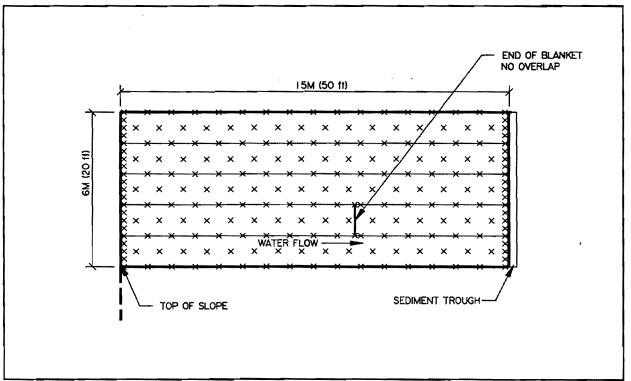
American Excelsior Curlex® 1:2 Installation Plan
